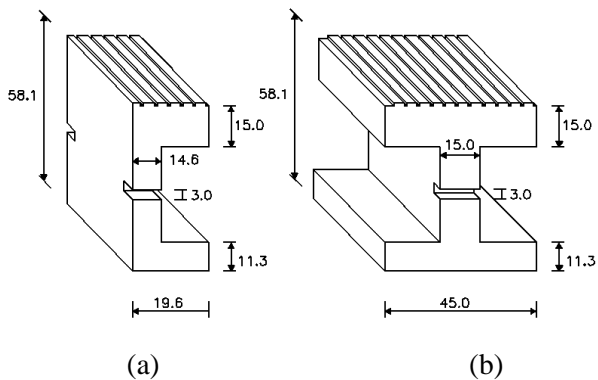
HPV Units: Specimens for (a) brick shell and (b) brick web
